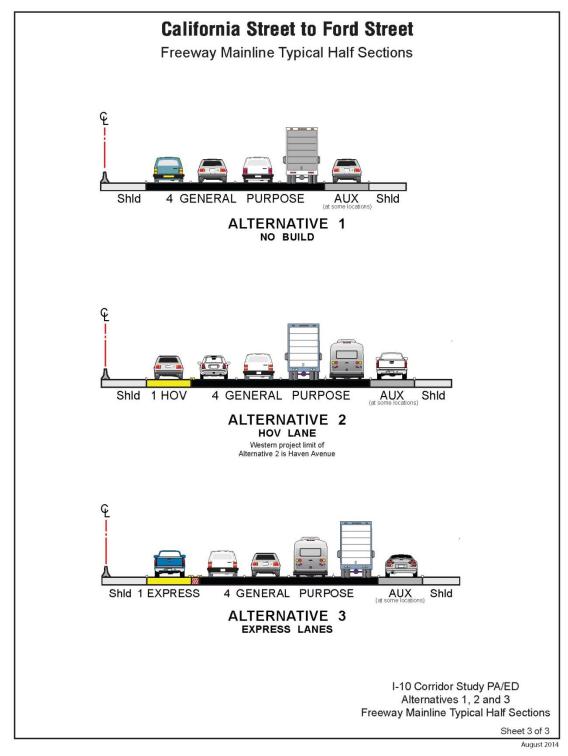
Alternatives 1, 2, and 3 Typical Half Sections (Page 3 of 3)
